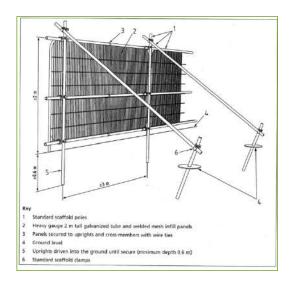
Shows the default specification of protective barriers (taken from BS 5837)
